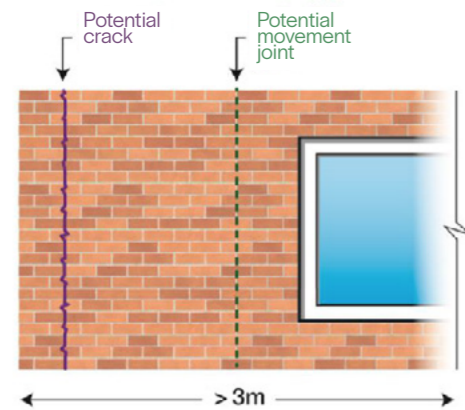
Corners are very stiff joints. A run of brickwork more than half the minimum allowance can lead to cracking near to the corners.
